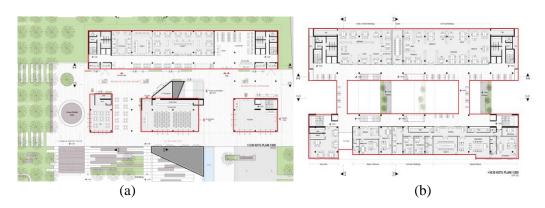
(a) Ground Floor Plan, (b) +16.50 elevation plan
